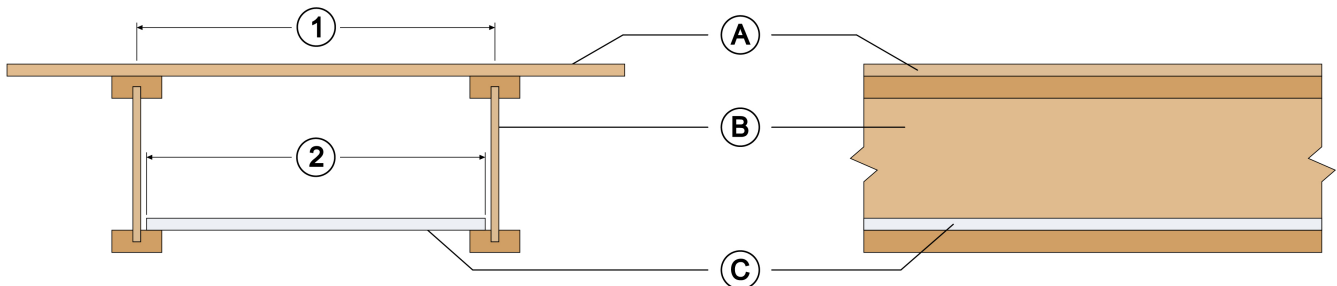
Fire protection of floors FP-06 - fire protection: 12.5 mm (1/2-in.) gypsum board installed on top of the bottom flange
